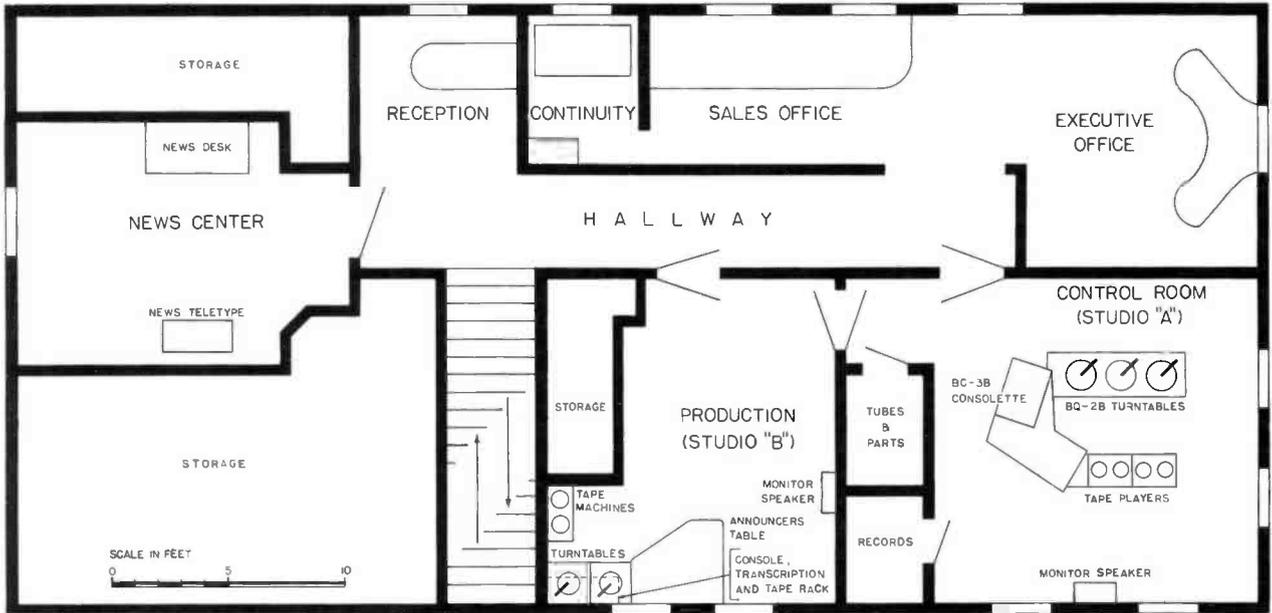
Floor plan showing all KBKC offices and studios, located on second floor of building. Large common reception room and lobby is on first floor.
